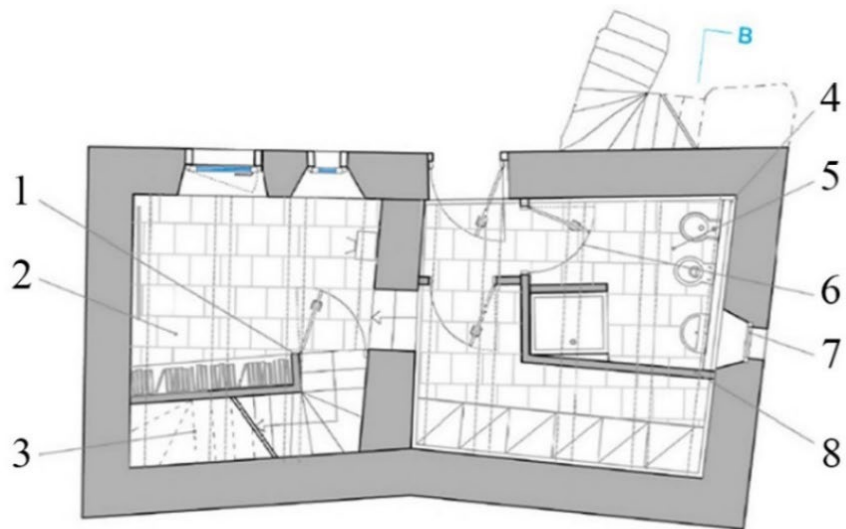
Casa Dell'affresco Detail of the works planned on the ground floor, (FoRTI, 2022)
